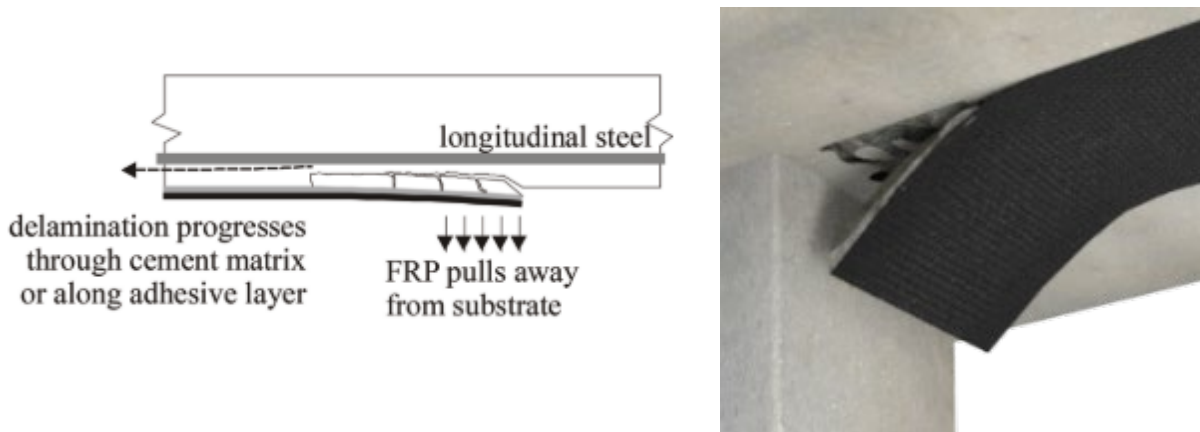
Concrete delamination (ACI 440.2R-17 2017)
